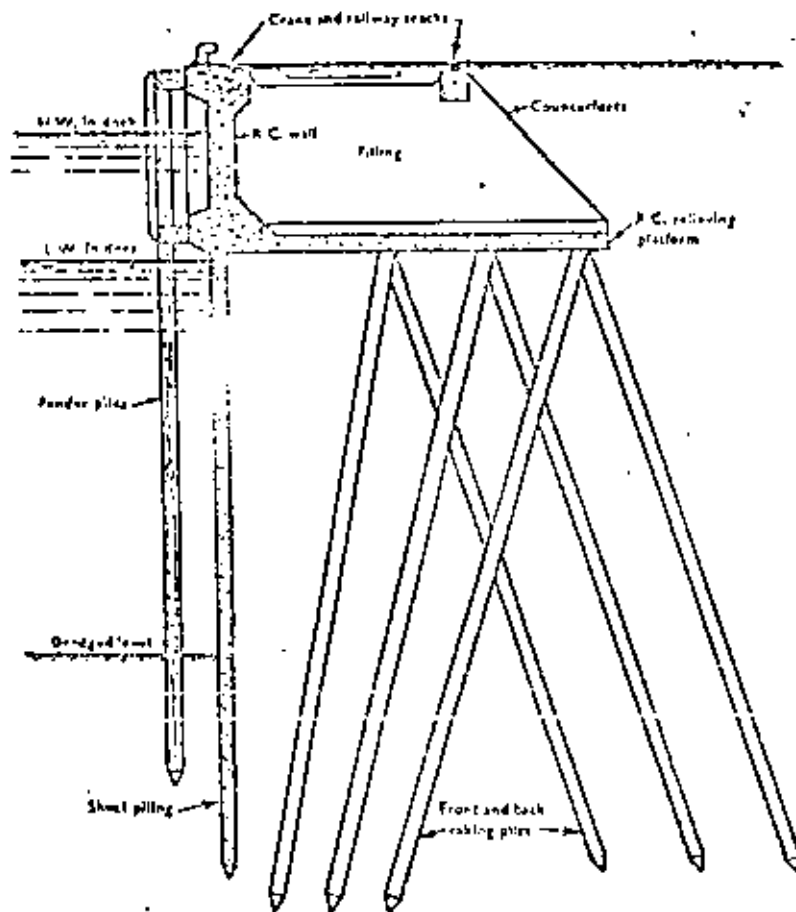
Quay wall with relieving platform on raking piles (7).
